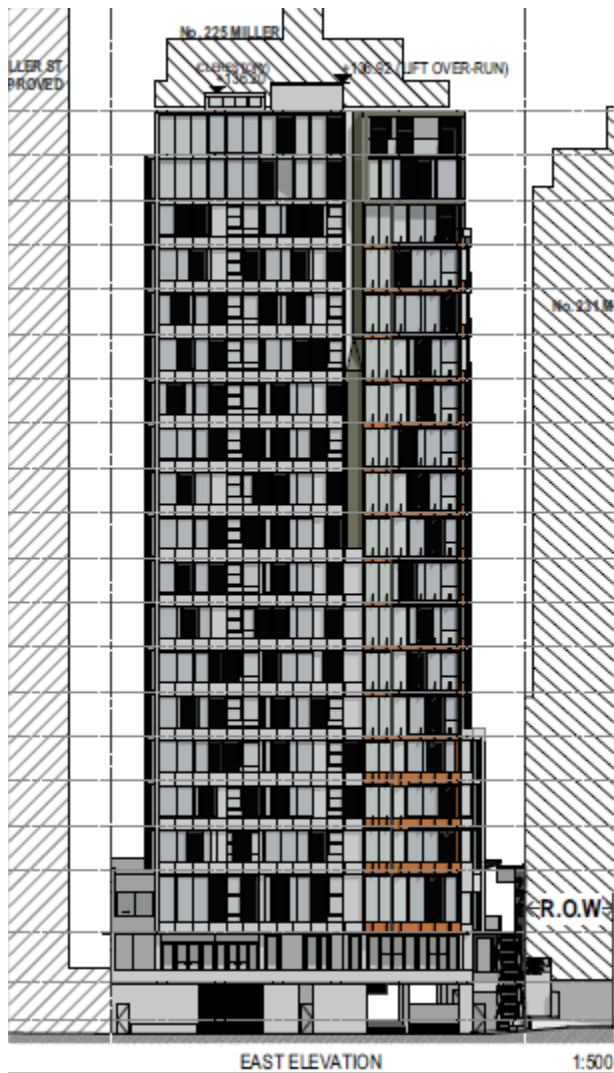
Proposed eastern (ROW) elevation of the subject proposal from the north east or Lower McLaren Street, North Sydney
